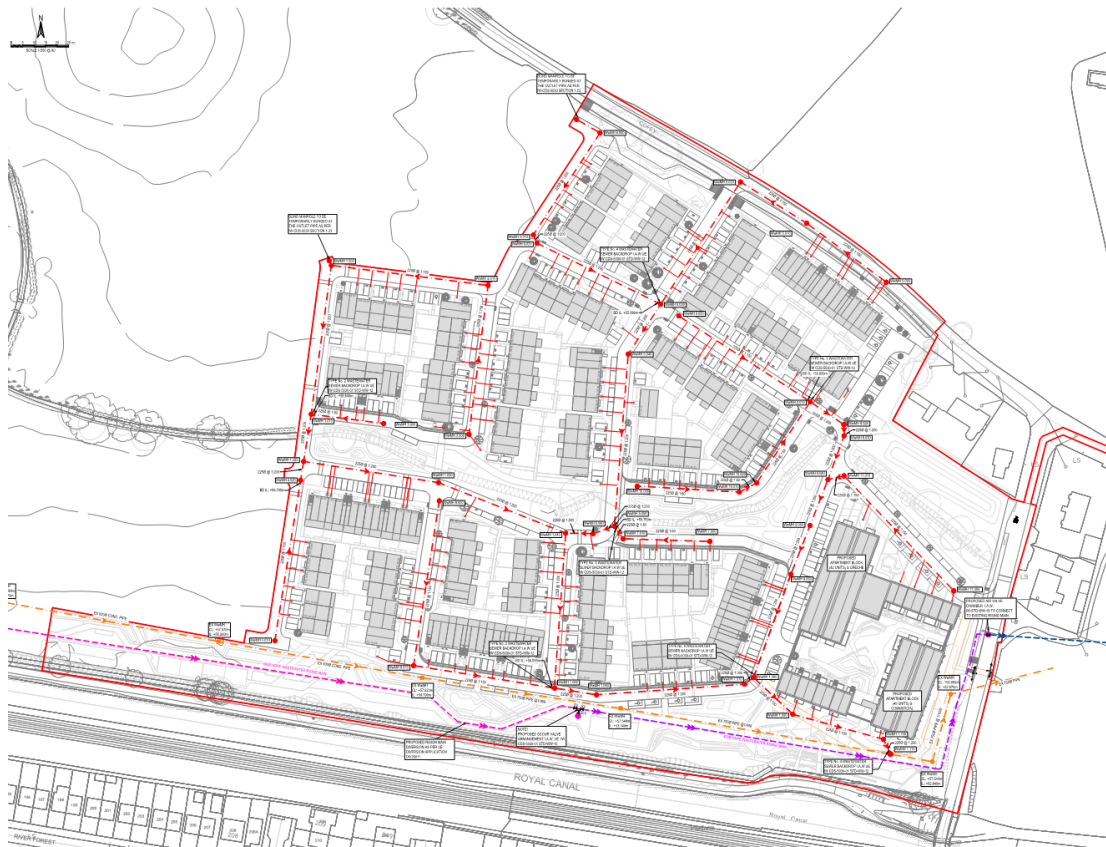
Extract from DOBA drawing C-0300 indicating the proposed wastewater layout (Source: DOBA)
